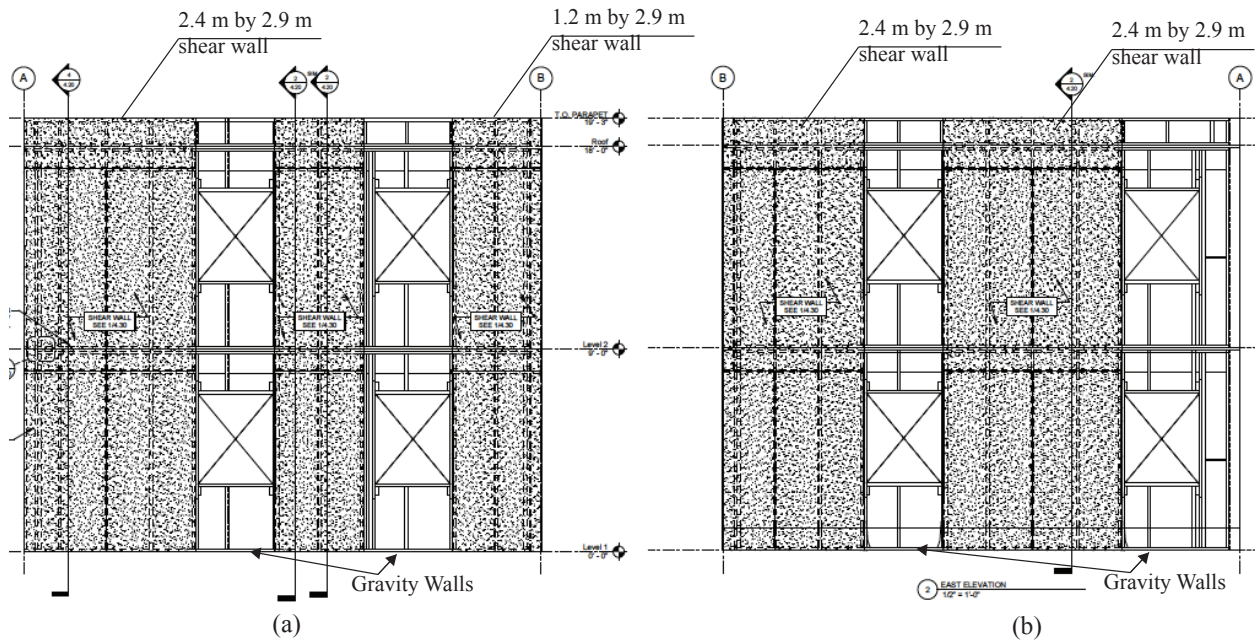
Short direction elevations for the CFS-NEES building system showing (a) the west shear wall system and (b) the east shear wall system [61]. Shaded areas represented sheathed shear walls which are part of the structural system, remainder is non-structural
